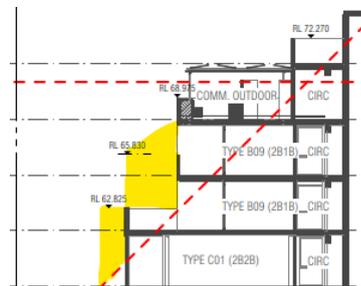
Excerpt of Site Section D (area of recession to Building 3 highlighted) (Fieldwork)
